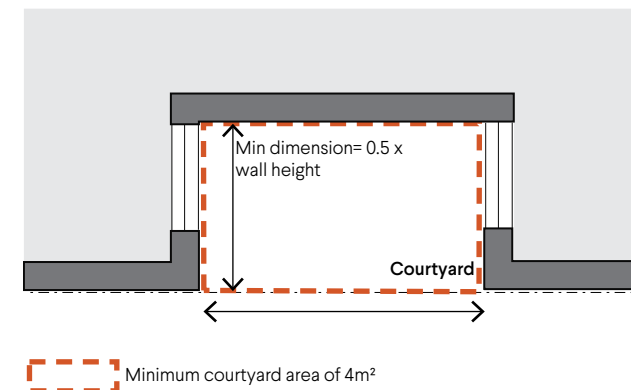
Courtyard minimum dimensions (multiple dwellings)
